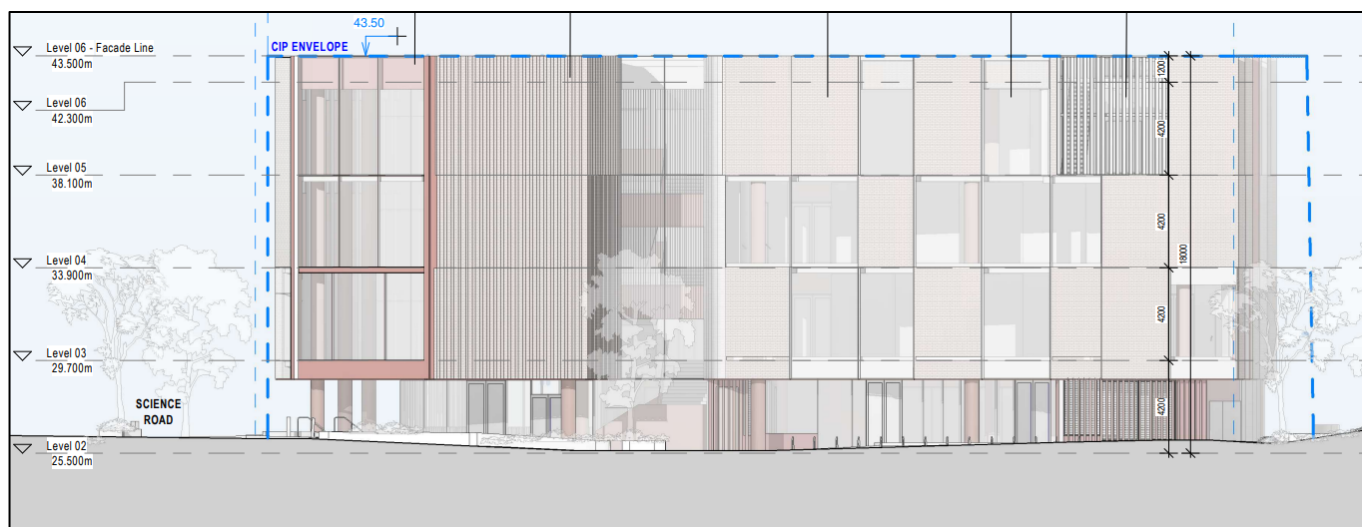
| East elevation (approved CIP envelope dashed blue) (Source: EIS)
